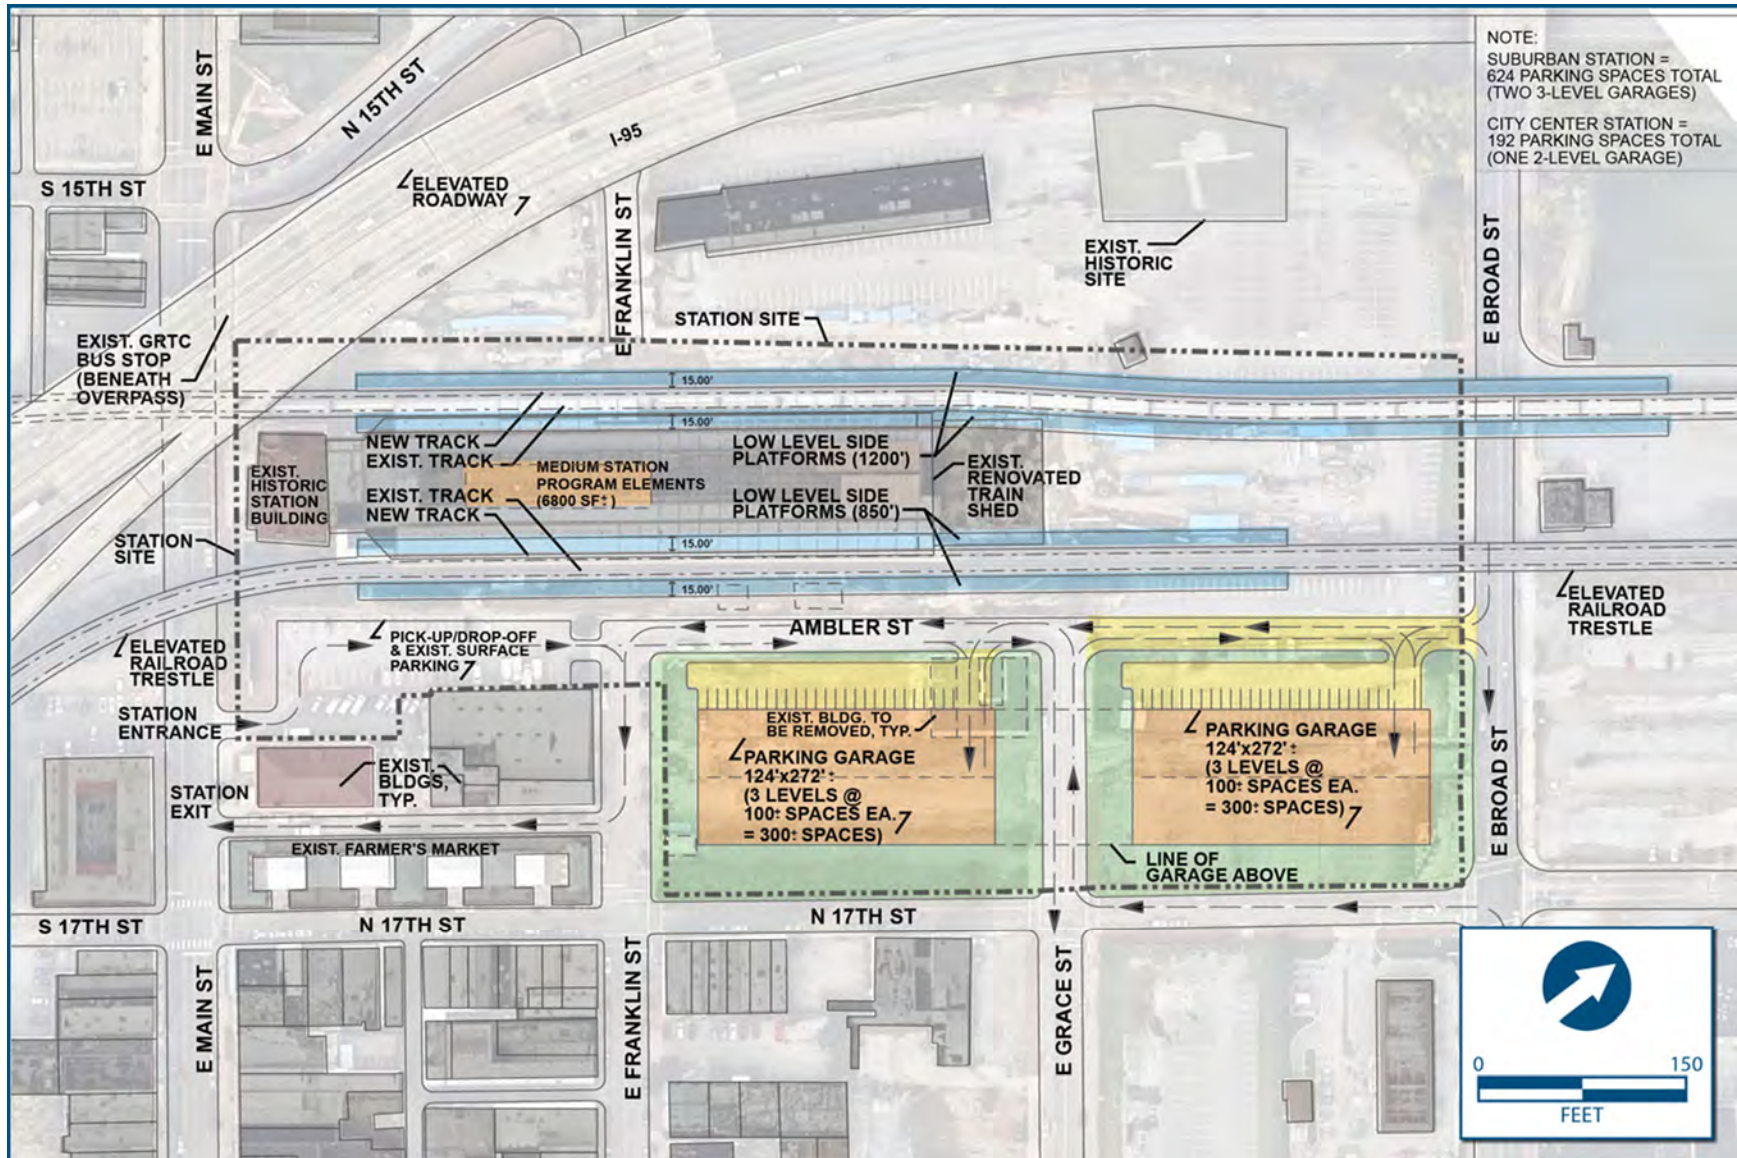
Main Street Station Improvements for Build Alternative 6D
